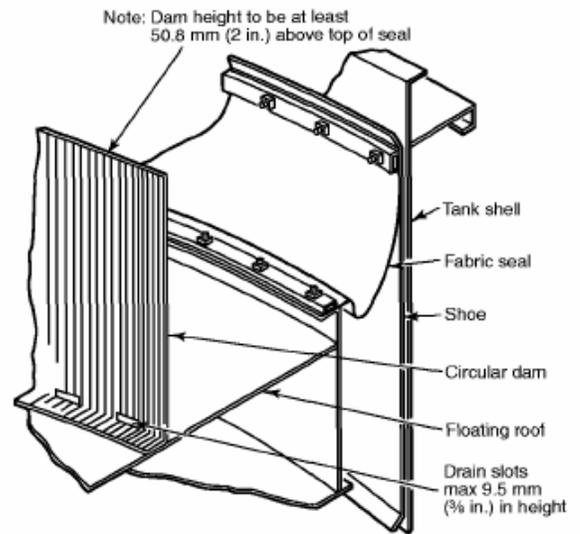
Typical Foam Dam [NFPA 11, p20]
